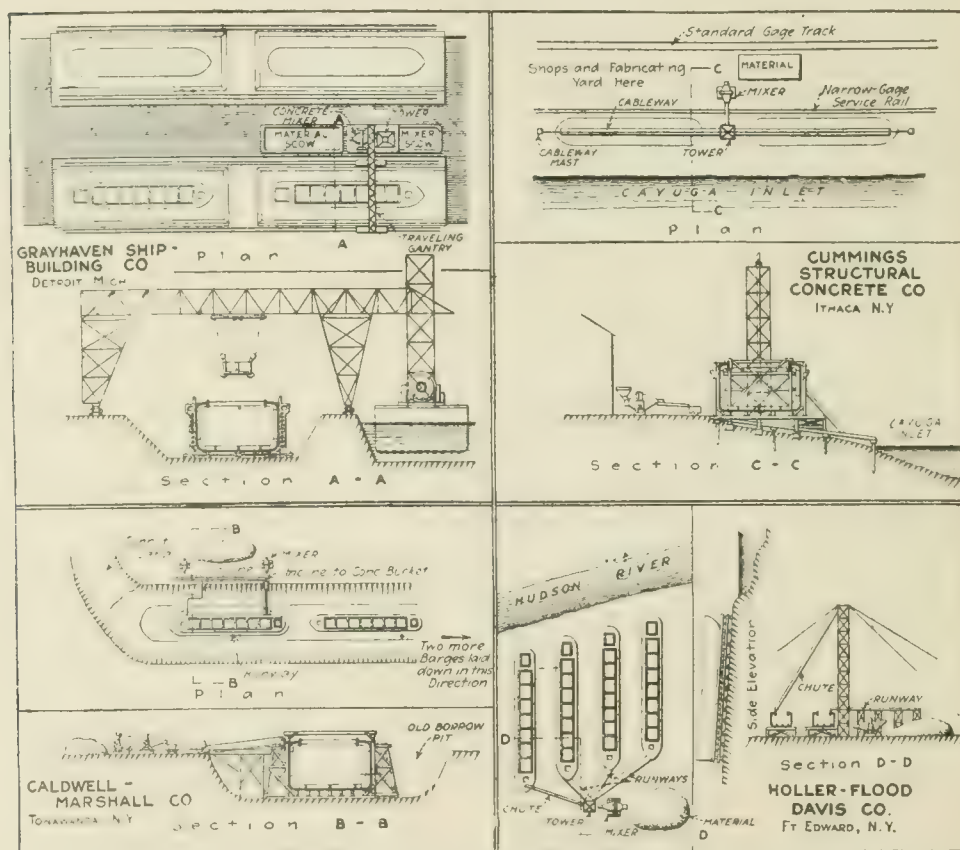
LAYOUT OF FOUR YARDS WHERE NEW YORK STATE CANAL 500-TON CONCRETE BARGE IS BEING BUILT.
